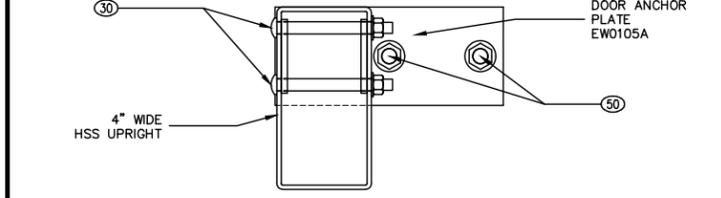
DOOR HEADER TO UPRIGHT CONNECTION
